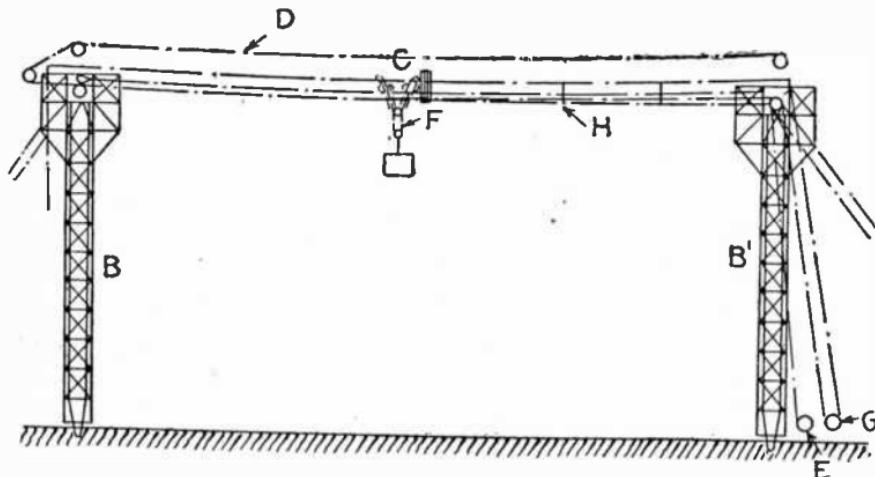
,951.—Cableway. The essential elements of construction are BB', towers; C, cable; D, hauling rope; E, hauling rope drum; F, hoisting rope; G, hoisting drum; H, hoisting rope slack carriers.
